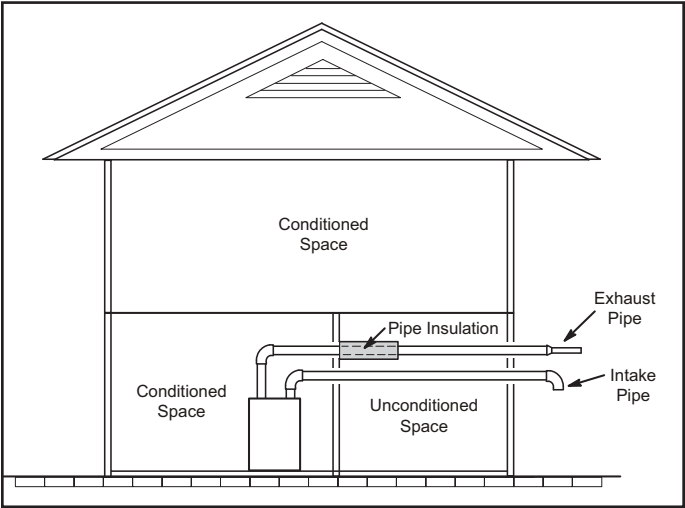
Insulating Exhaust Pipe in an Unconditioned Space
